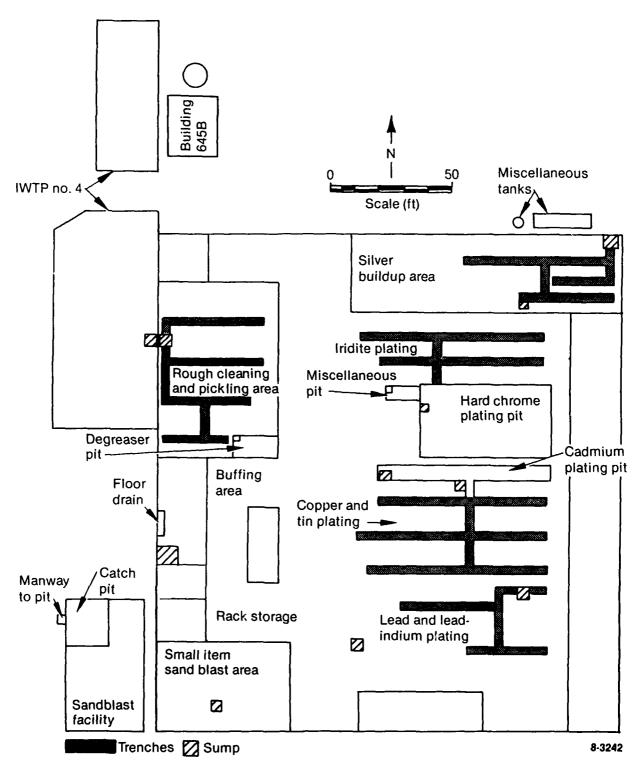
Plan view of Building 666 and IWTP No. 4 before dismantlement, including location of trenches, sumps, and pits.
